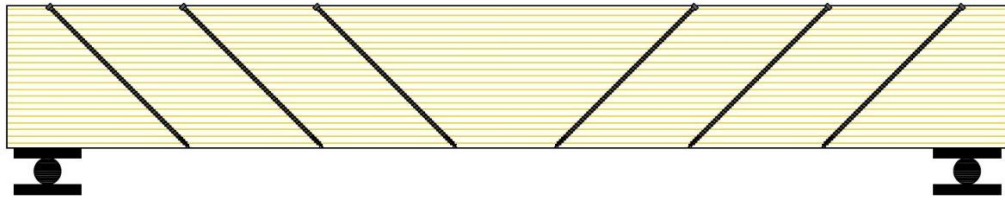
Arrangement of shear reinforcement of timber beam.
